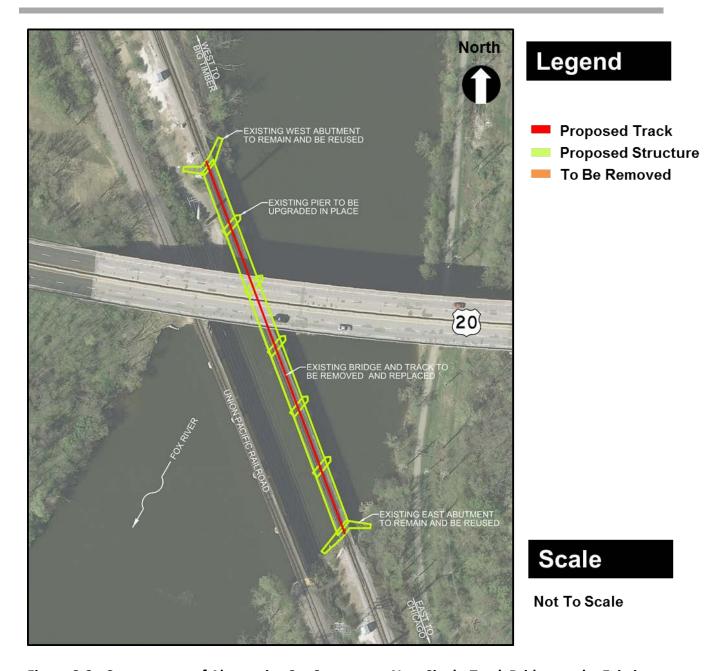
Components of Alternative 2 – Construct a New Single-Track Bridge on the Existing Alignment
